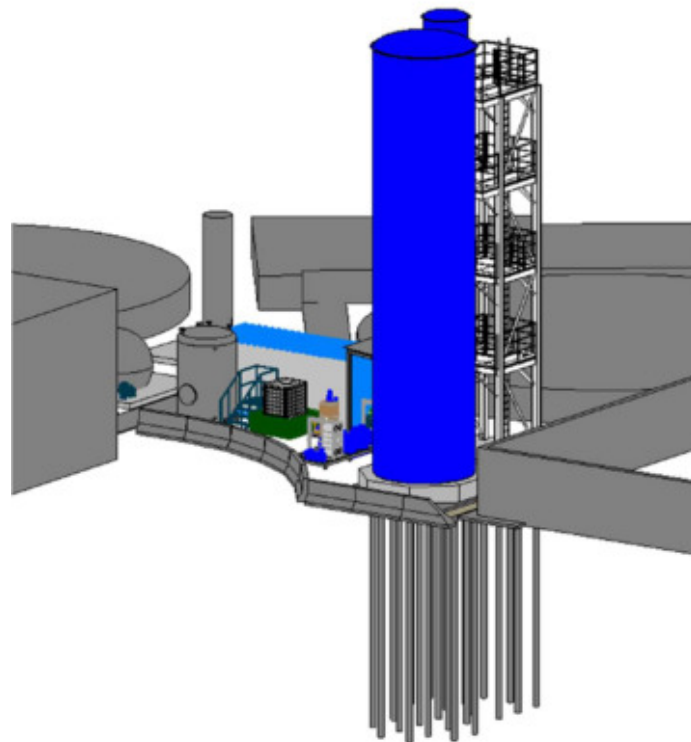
3D overview of the precommercial size ELSAR®. Micropiles, concrete deck and metallic structure on both vertical tanks can be seen. Mobile concrete barriers to protect vehicular collision can also be seen.
